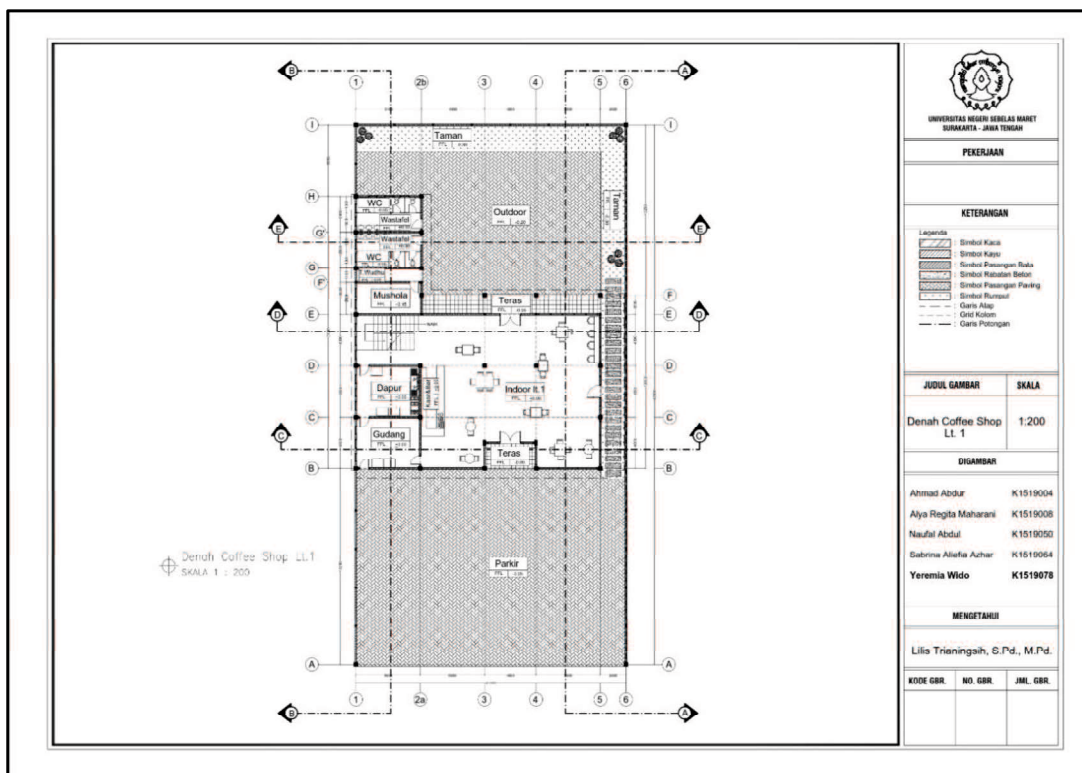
8 Students' Construction Drawing (floor plan drawing by pink team)
